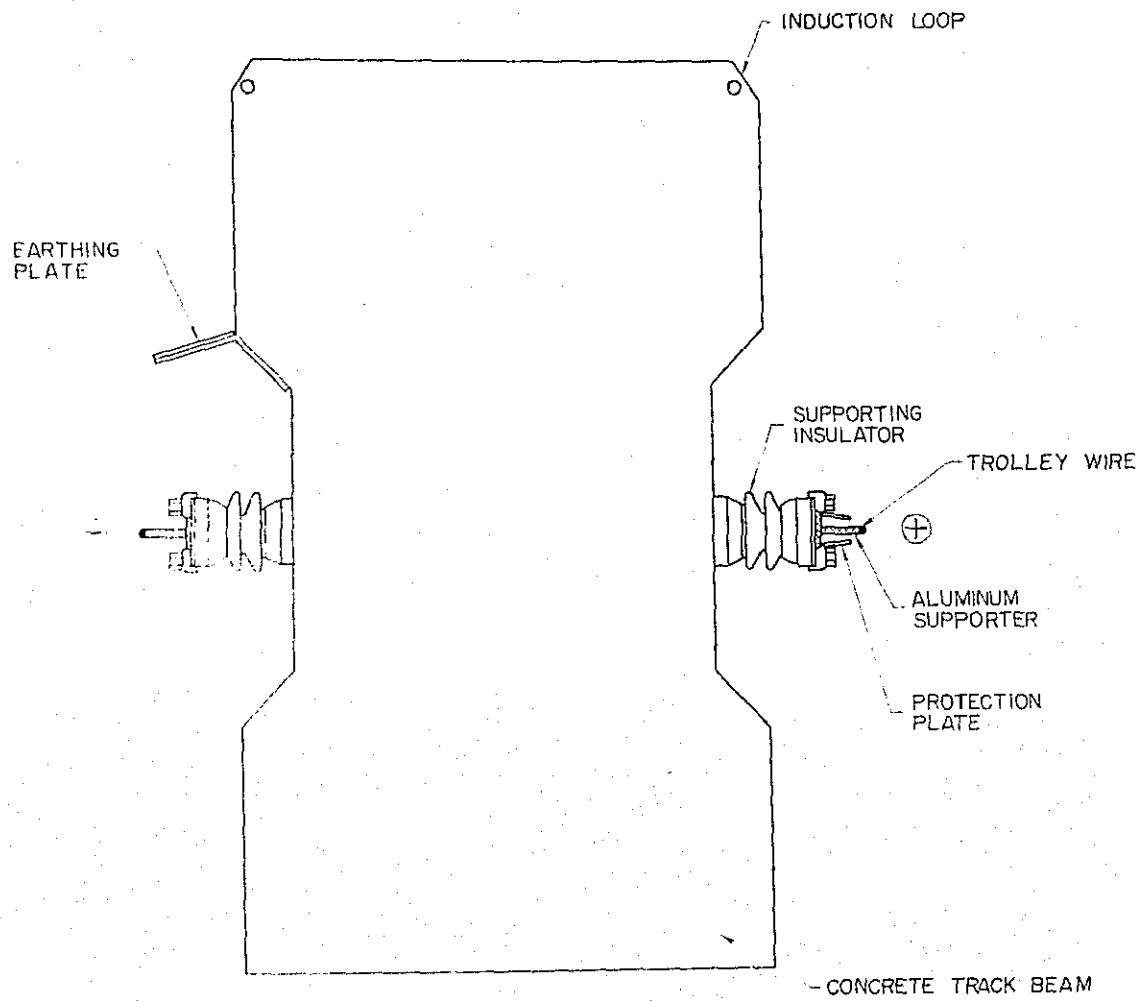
(2) INSTALLING OF ELECTRIC POWER SUPPLY IN RAIL AND EARTHING PLATE
